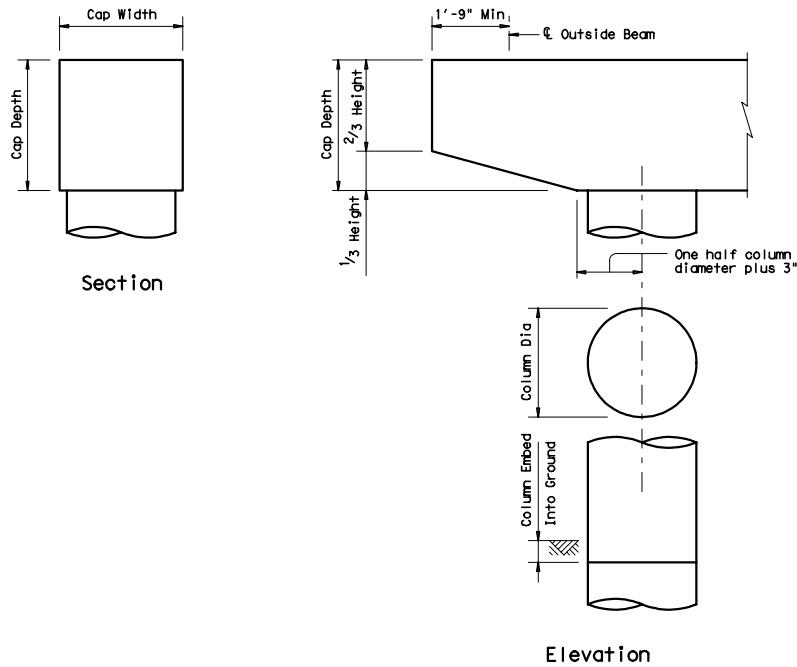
Typical Elevation and Section. Online users can click 4-3 to view this illustration in PDF.
